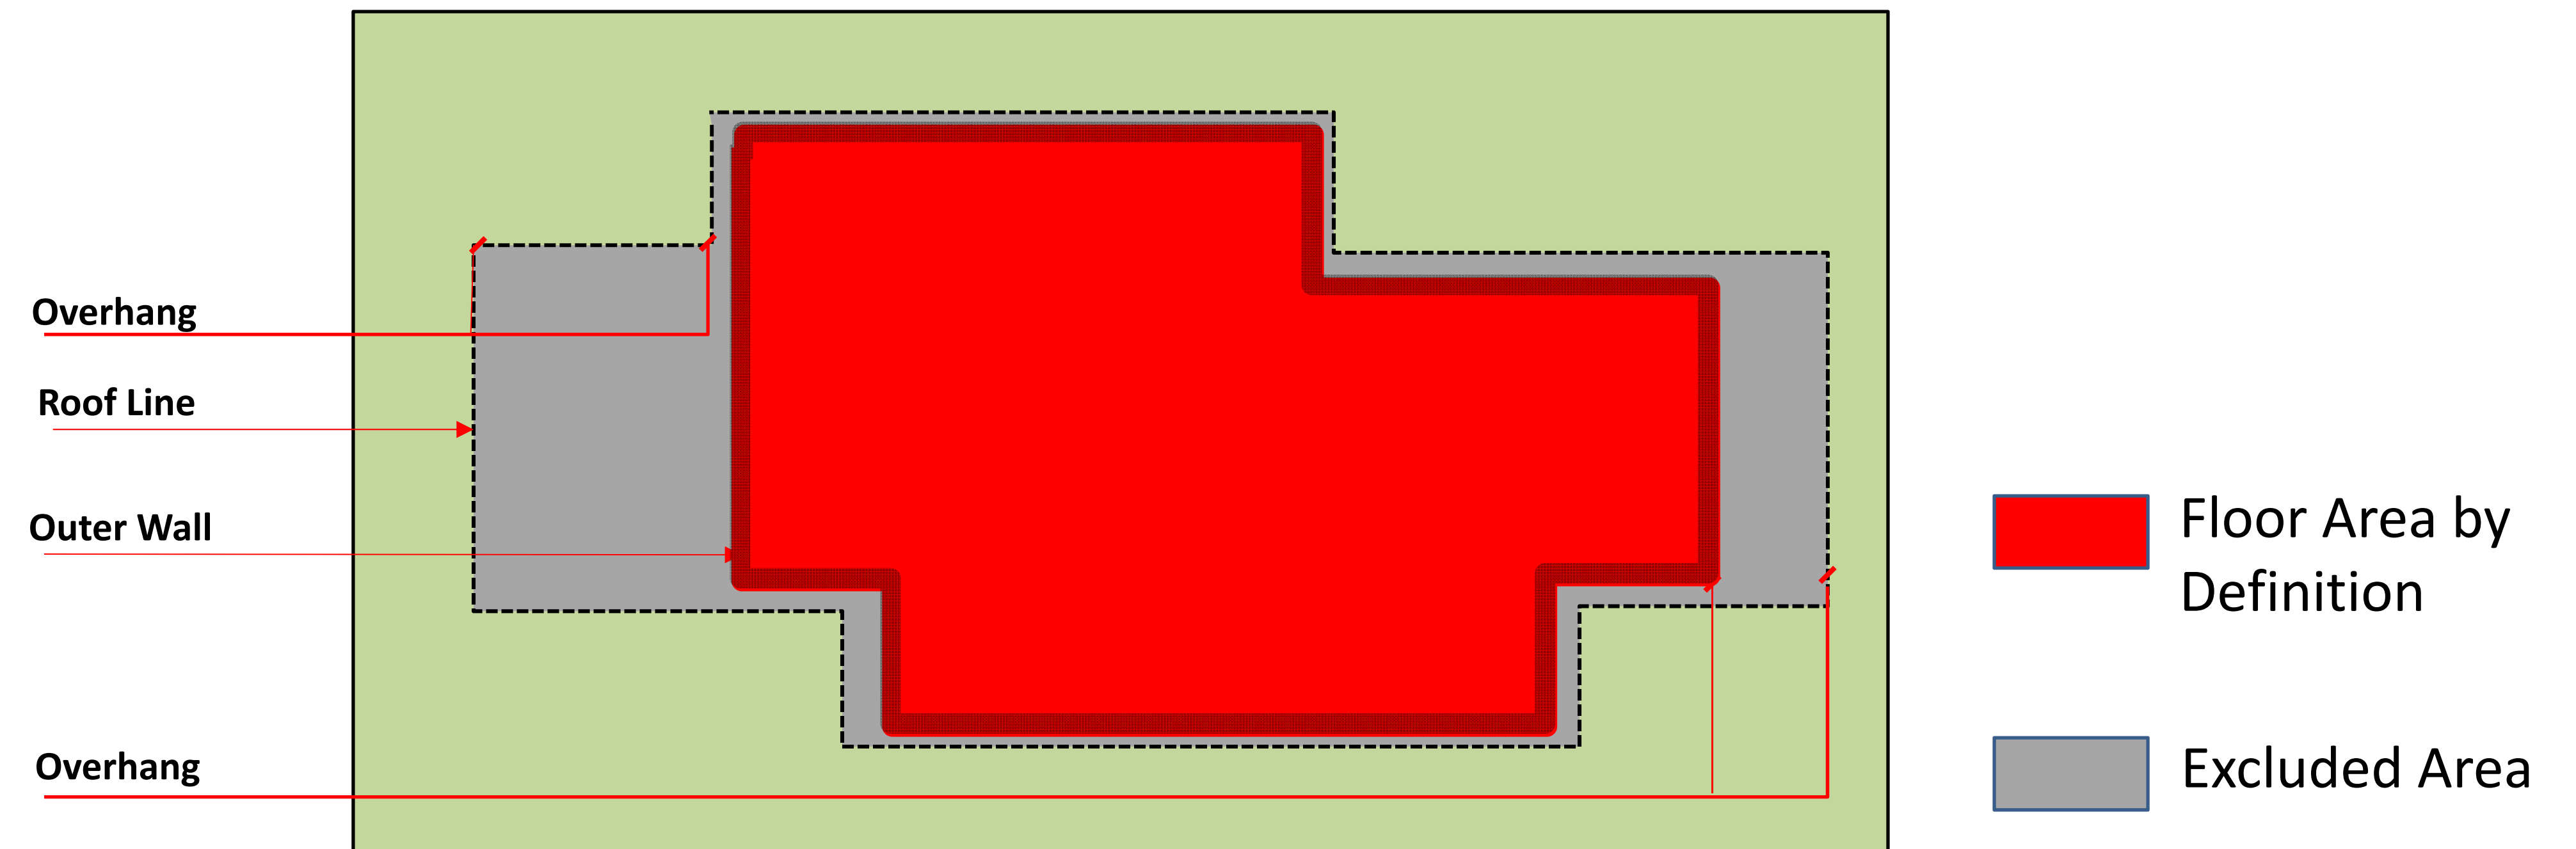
Diagram of Floor Area Calculated under Current Definition (Bylaw No. 1285)
